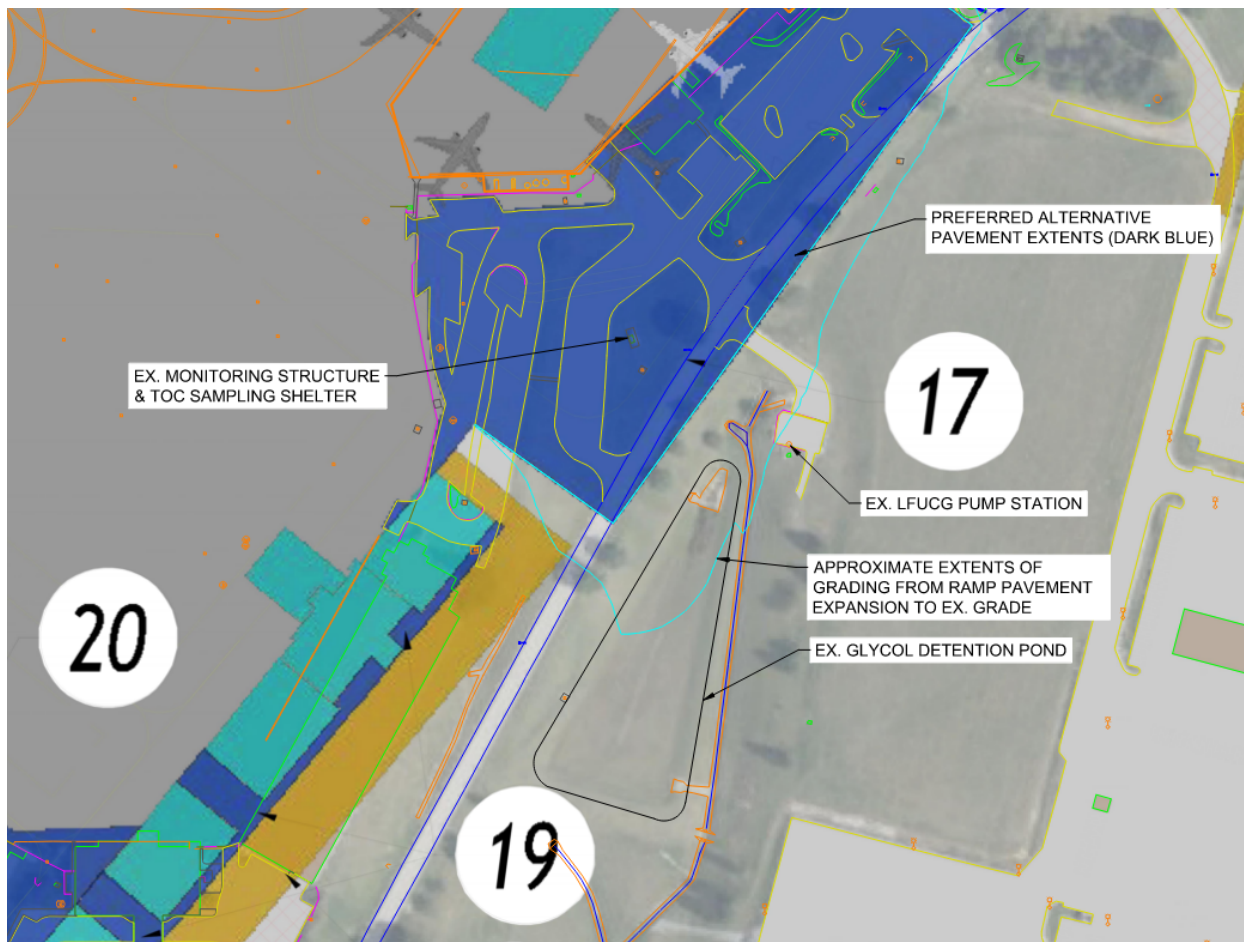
Impacts of Terminal Ramp Expansion Under Airport Master Plan Preferred Alternative
